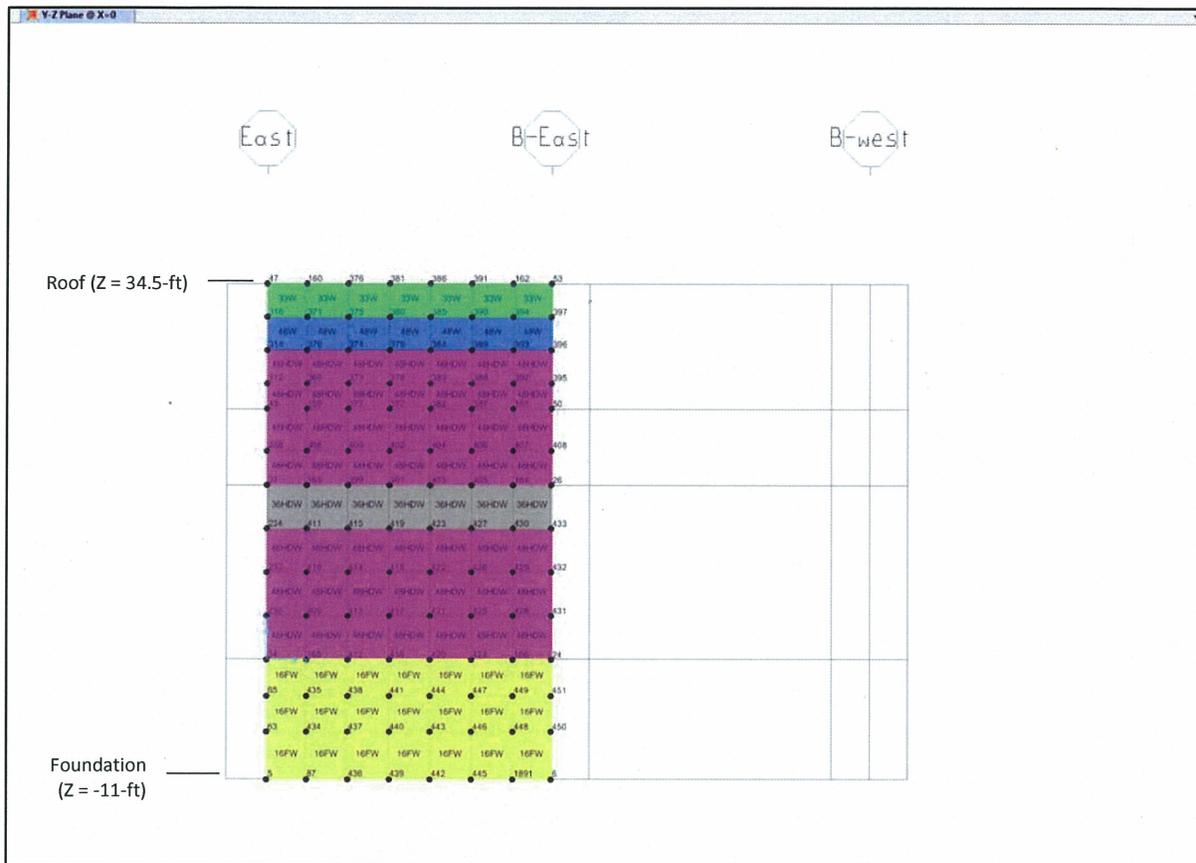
REC SAP2000 C-D-South Elevation Looking South
